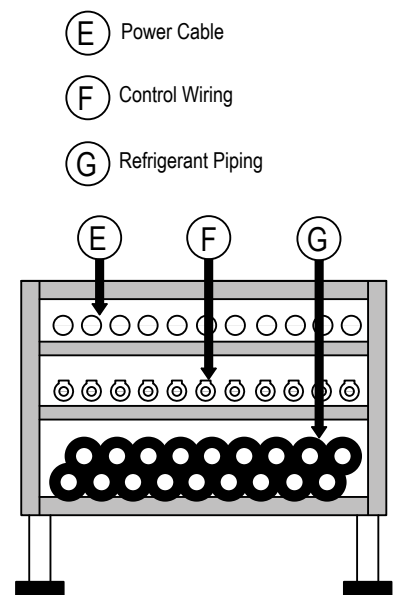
Multiple Outdoor Unit Installation—Suggested Arrangement of Refrigerant Piping and Power Wiring / Communications Cables Using a Multi-Tier Tray System
